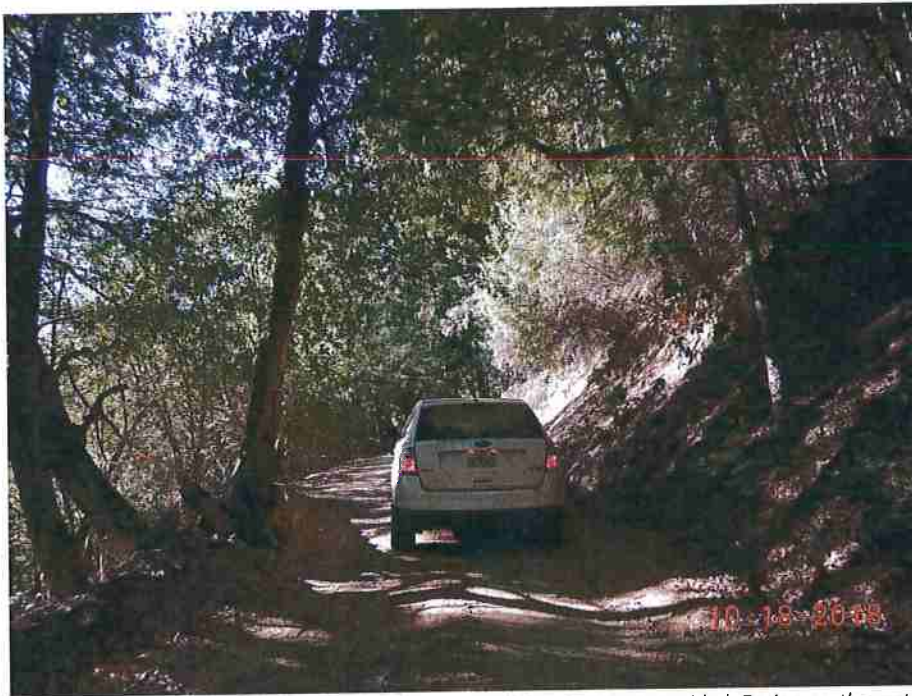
RP10. Pinch point. No sight distance restriction. Turnout provided. Facing north-west.
